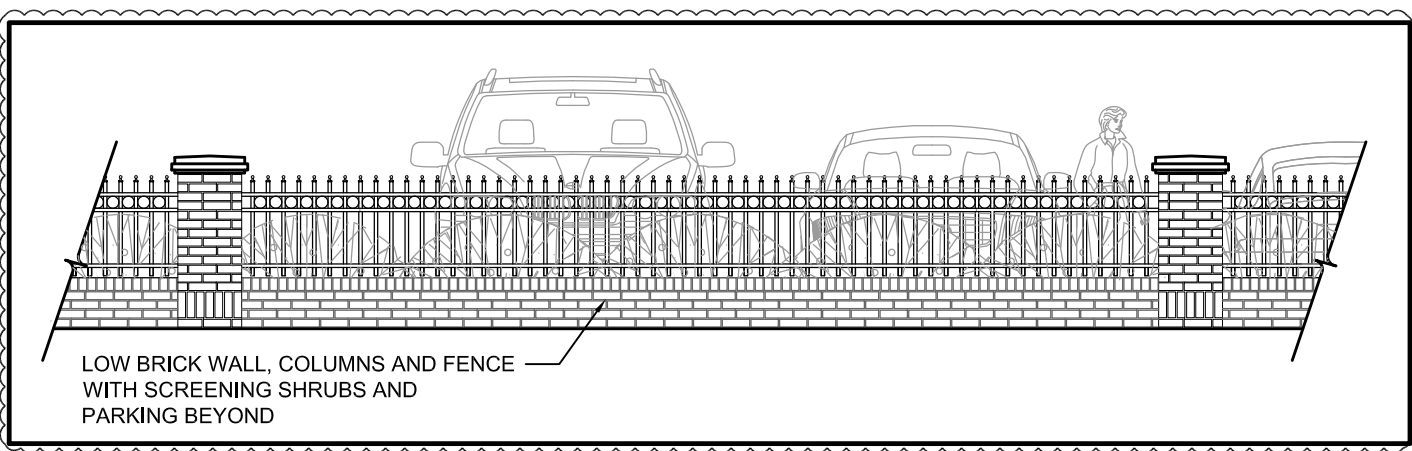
EXHIBIT A: W.T. HARRIS BLVD. BLDG. ELEVATION FOR PARCEL 6 - PROPOSED ARCHITECTURE (NOT TO SCALE)
